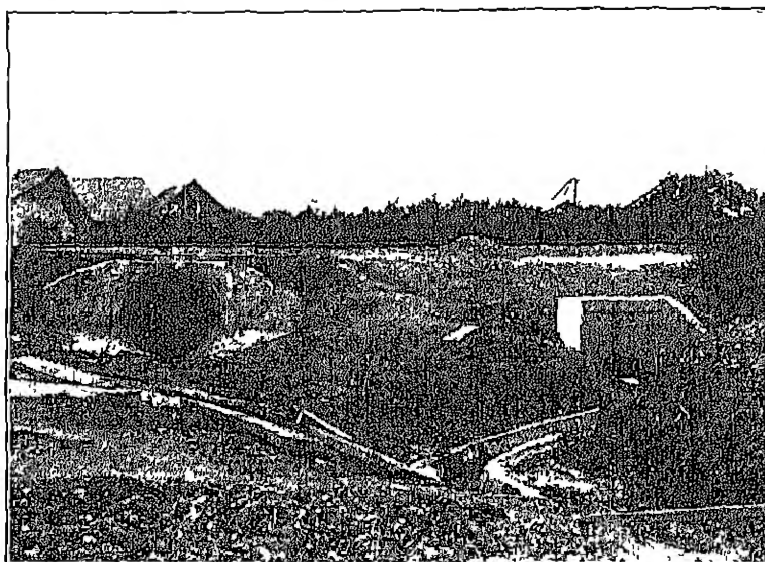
Culvert at Port Swettenham. The photograph shows the old culvert on the left. The small culvert on the right is the low-level culvert put in by Mr. Byrno. It is 3 feet lower than the old culvert, and has enormously improved the drainage of the town. The high tide of October, 1909, came over the railway at this point.
